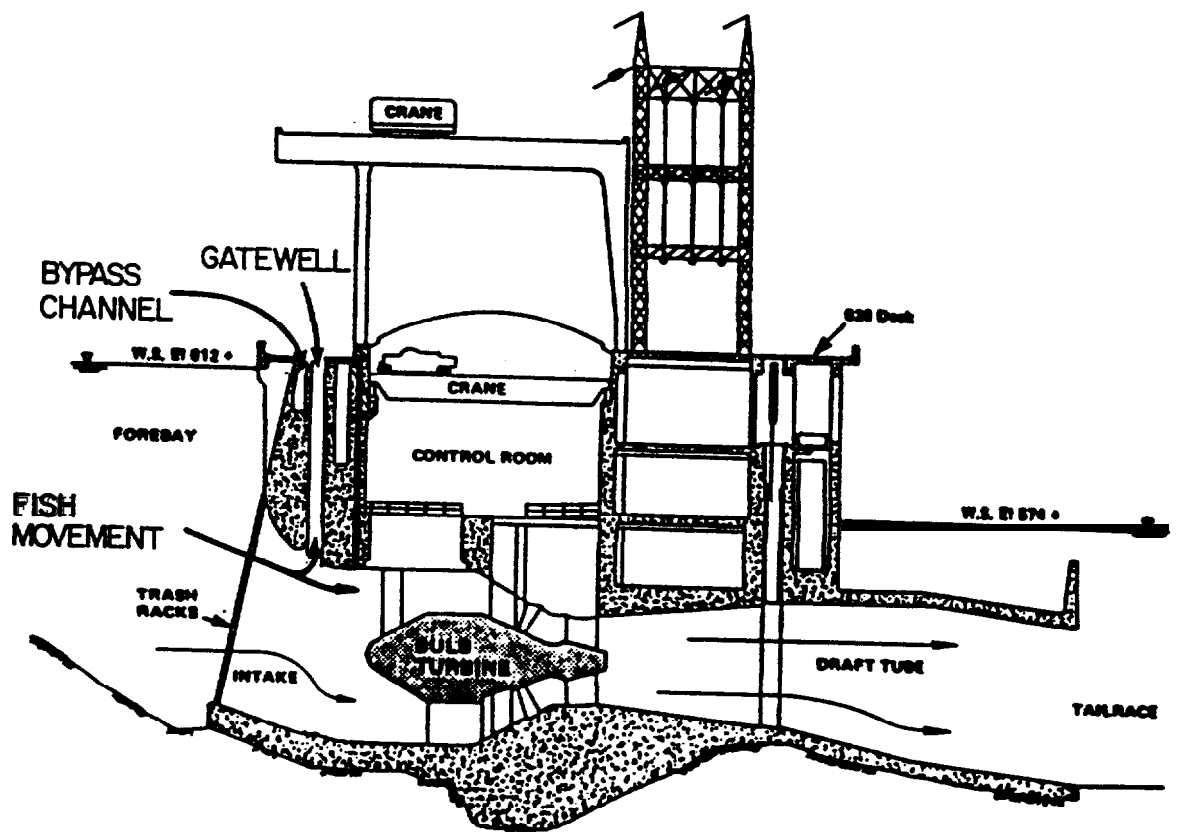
Section through Rock Island Dam second powerhouse indicating fish movement into gatewell system.
